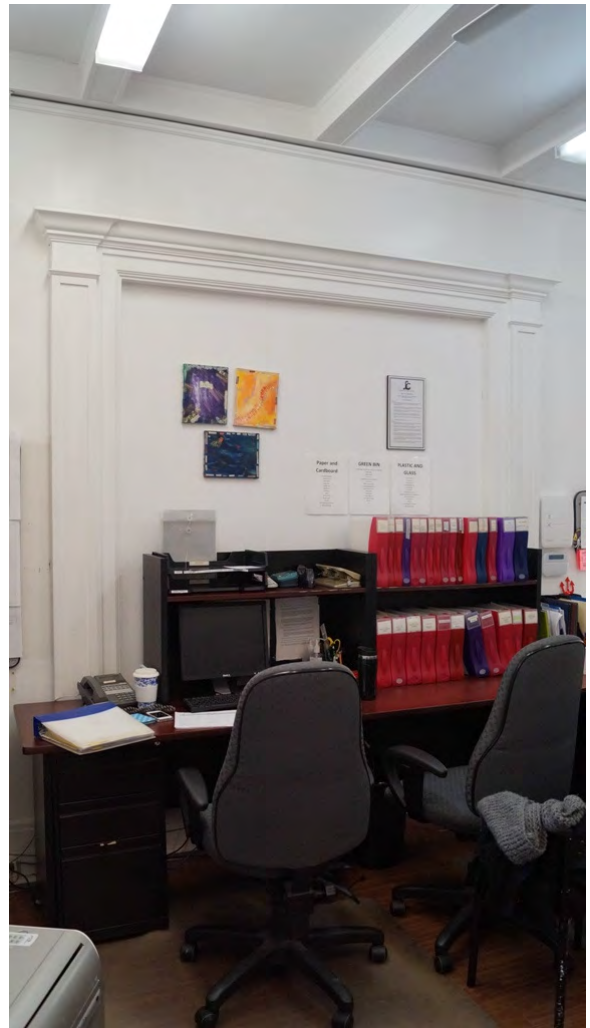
Closed-up opening in drawing room's west wall, with a Classical frame of pilasters and entablature
